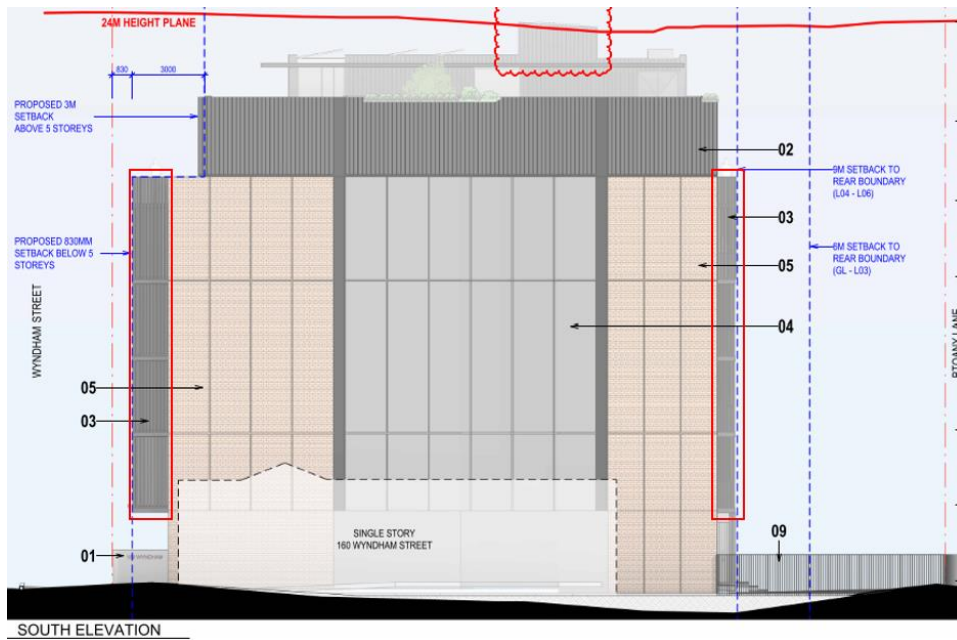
Amended southern elevation showing narrower balconies and privacy screening
